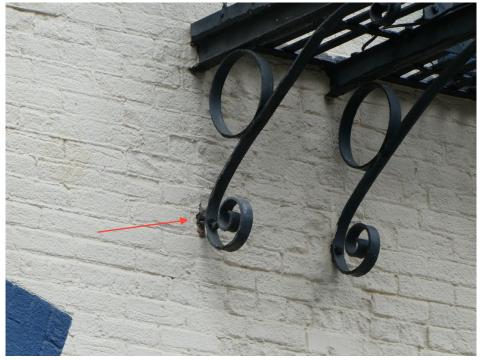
Loose anchor and masonry loss at the connection point between the masonry and the fire escape, above the second floor, south façade.
